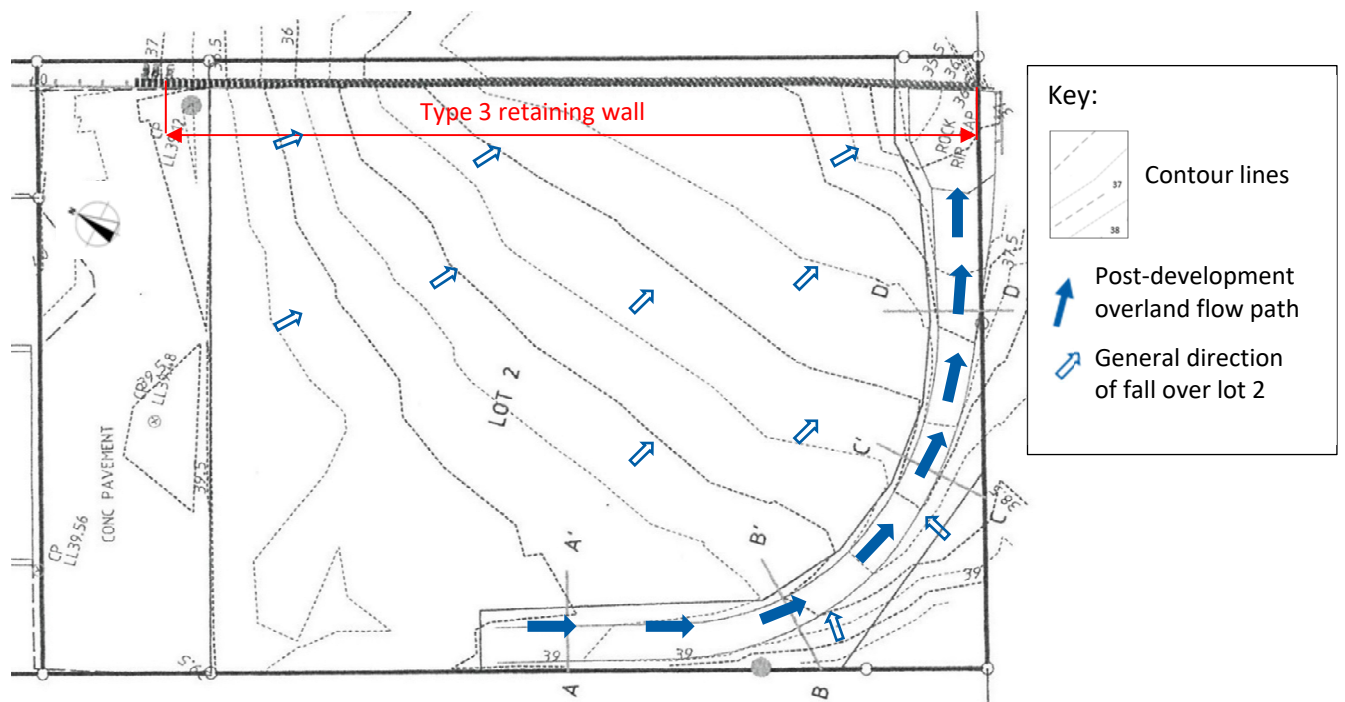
Site plan – post-development overland flow path²⁰ (not to scale).
